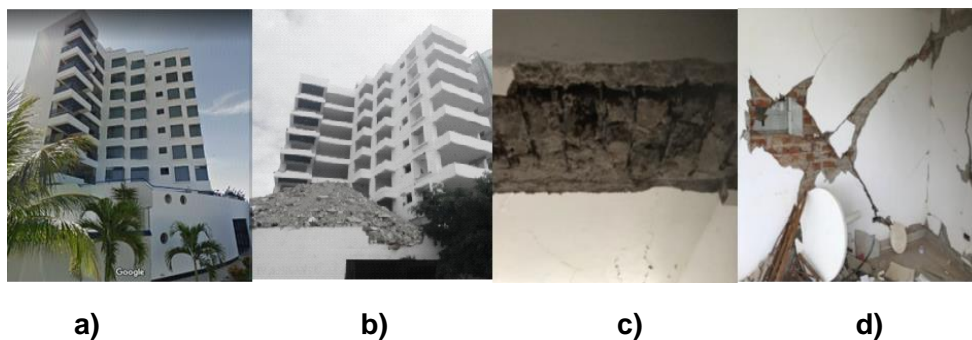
(a) The Almirante Building of 9 floors of reinforced concrete located in Bahía de Caráquez city; (b) Detachment of covering and fissures in front; (c). Steel of reinforcement corroded in girder of social area; d). Detachment of internal masonry.
